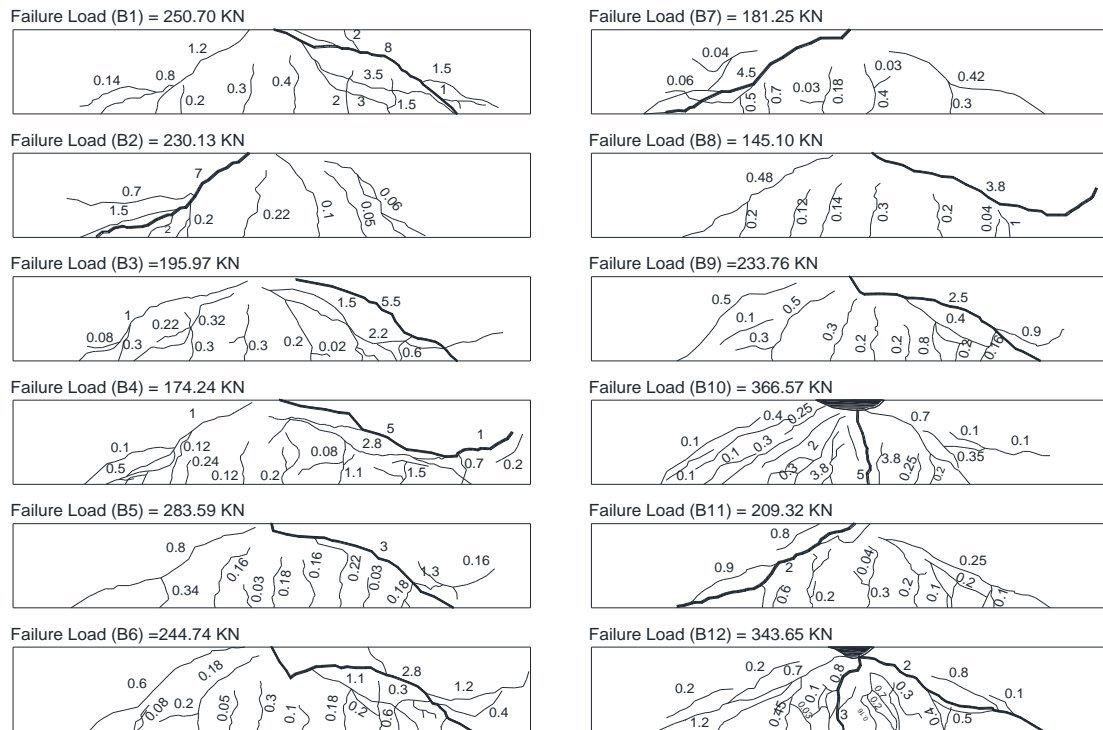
Crack patterns of tested beams at failure (crack width in mm)
